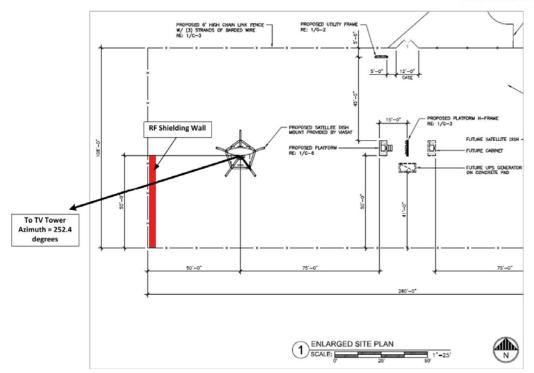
RF Shielding Wall Location Between Viasat Antenna & TV Tower
